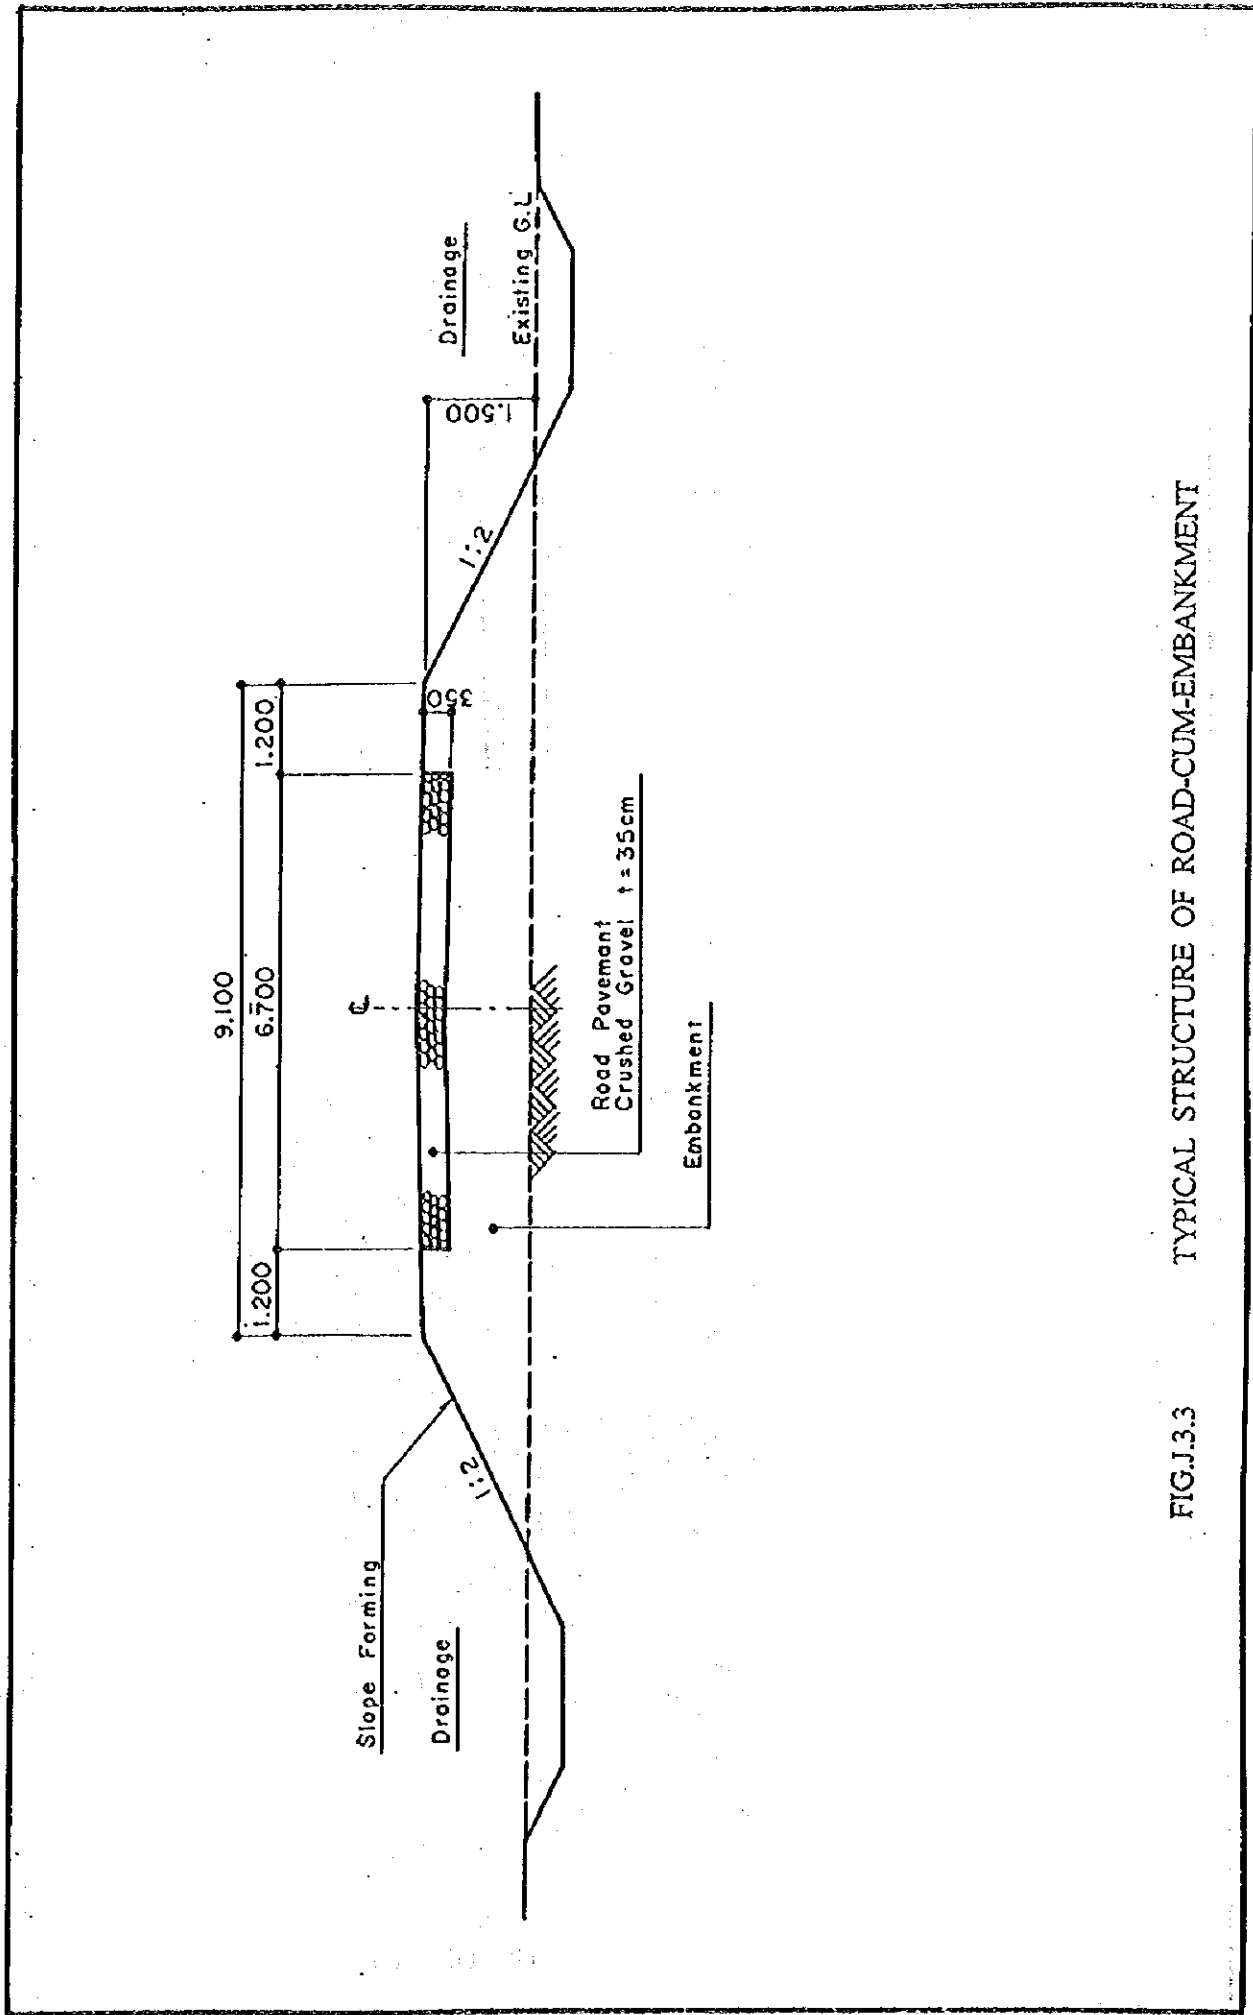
TYPICAL STRUCTURE OF ROAD-CUM-EMBANKMENT
